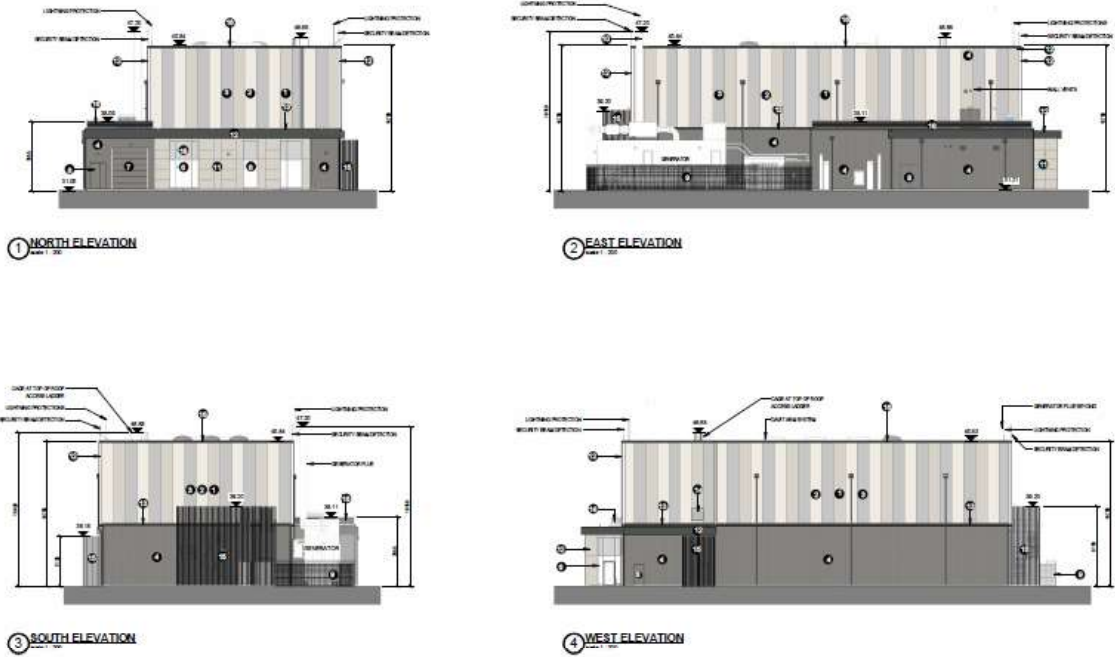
Proposed Elevations (please note – a larger version of plan can be found in the Committee Plan Pack)
